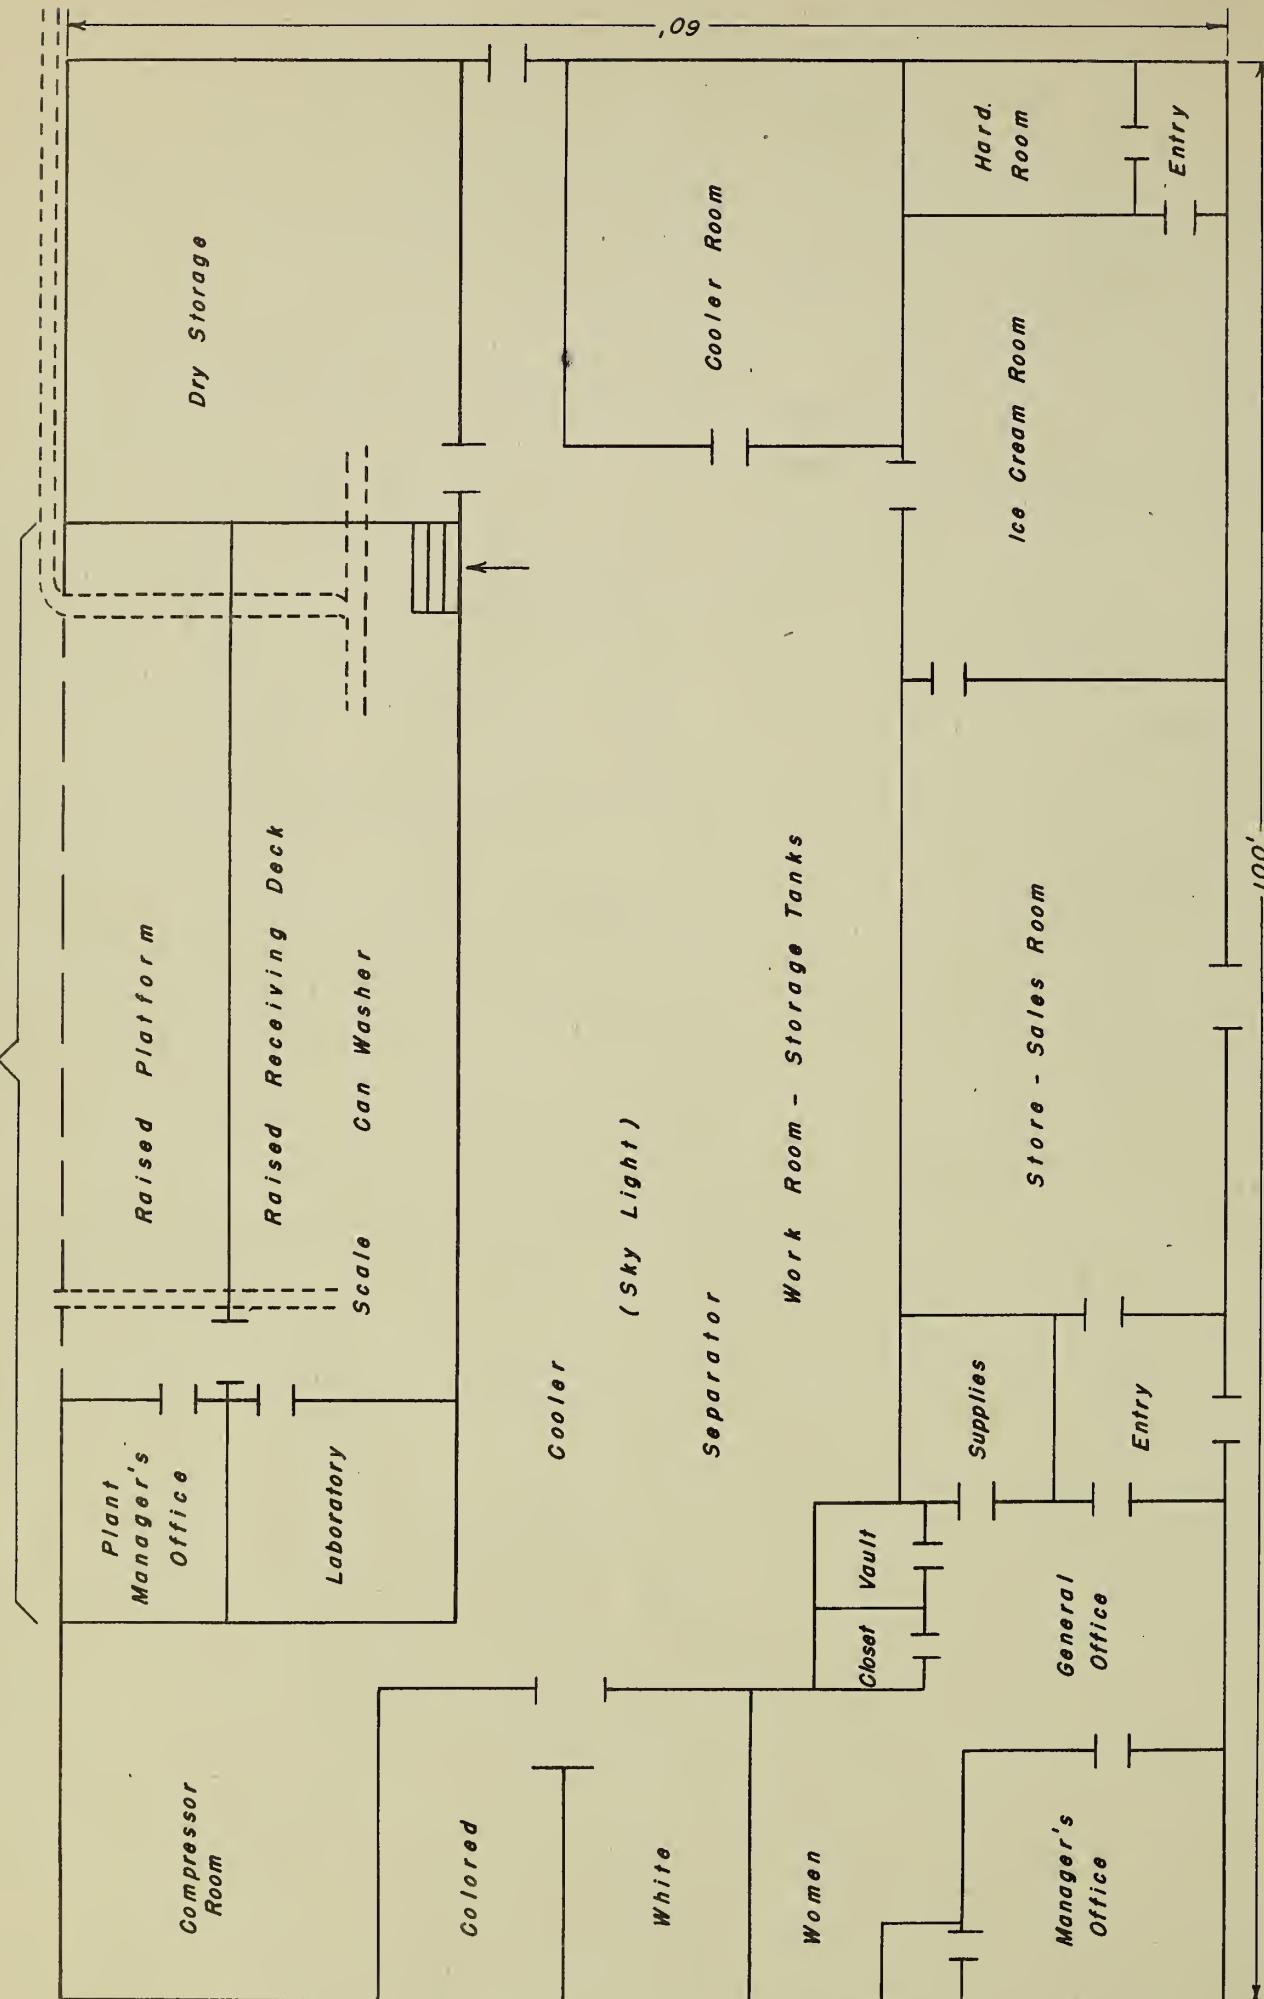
Suggested floor plan for dairy store and milk cooling plant to handle 10,000 gallons daily.
